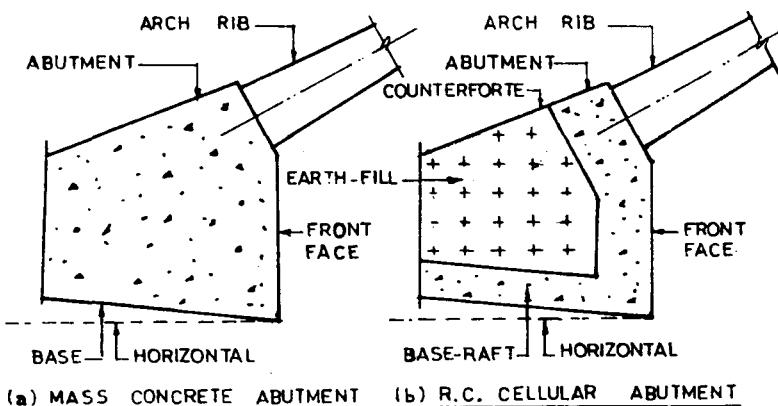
ABUTMENTS FOR ARCH BRIDGES
